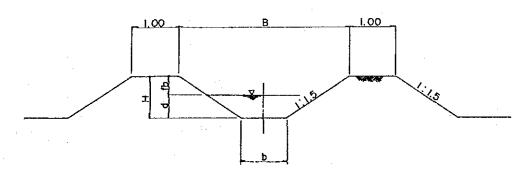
Typical Cross Section of Proposed Tertiary Canal
